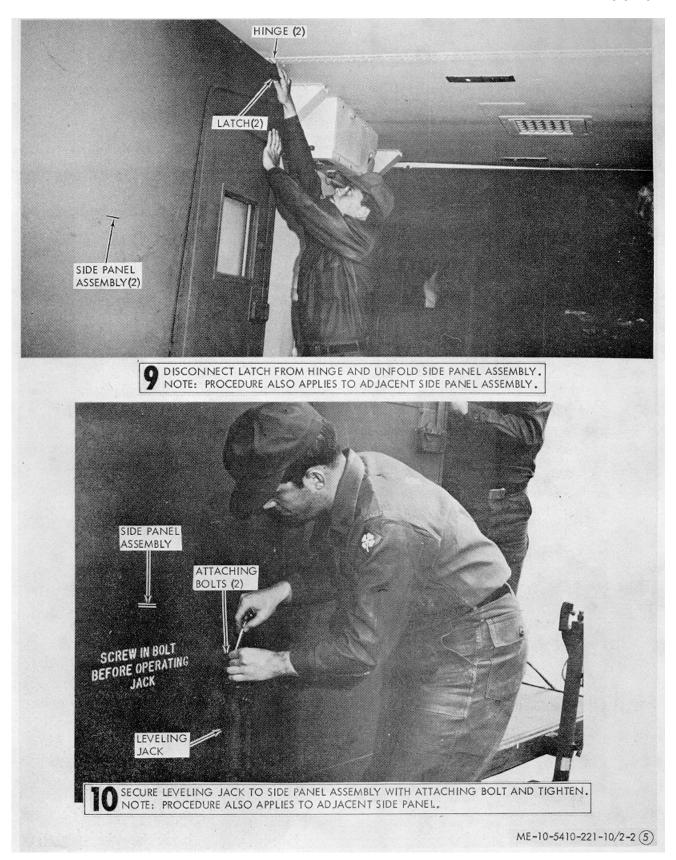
(5). Erection of expandable shelter, (sheet 5 of 18).
